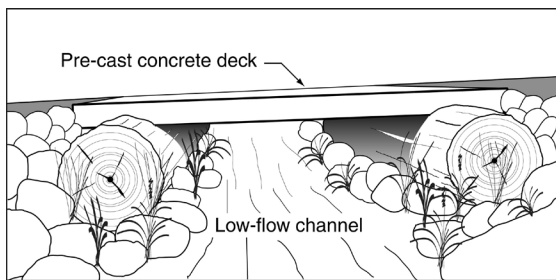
Bridge formed from logs and a box culvert bridging slab
